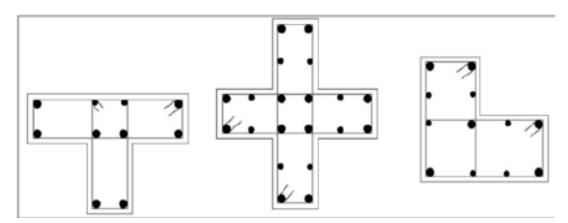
Specially shaped (T, +, Plus) columns with Longitudinal and lateral reinforcement.
